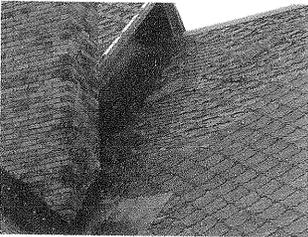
North, East corner of church facing Hogans Alley. Damaged and or missing shingles and damaged flashing. Improper repair with rolled roofing. Rotten trim, peeling paint.
